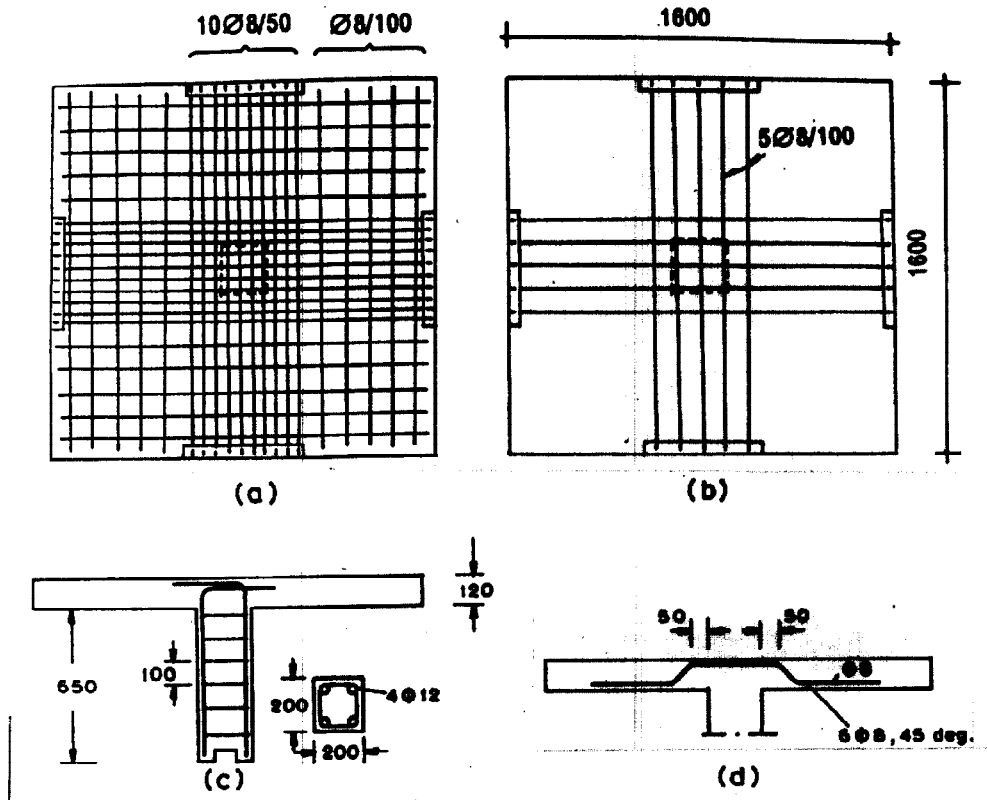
(a)Top reinforcement mats of slab, (b)Bottom reinforcement mat of slab, (c)Reinforcing details of column and (d)Punching shear reinforcement of specimen S_1 (dimensions in mm)
